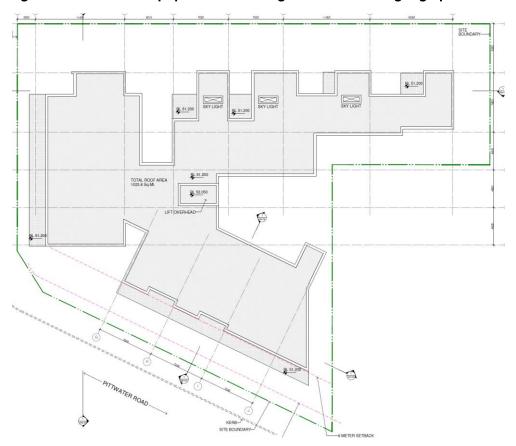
extent upper level roof area that exceeds 21m building height plane
